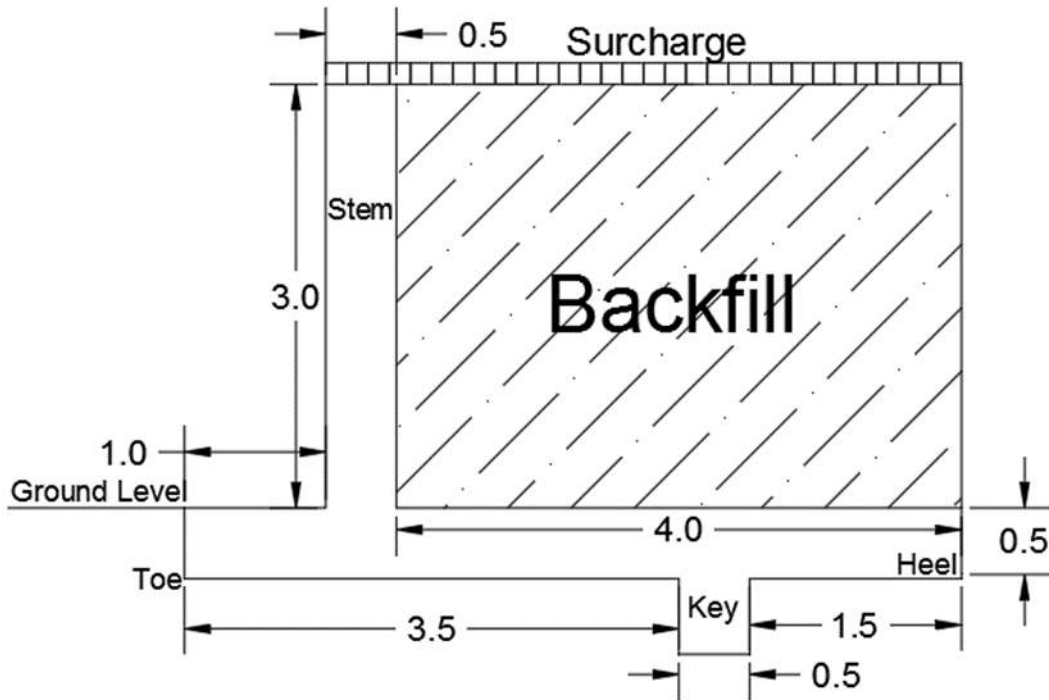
Final design for Underneath Cantilever Retaining wall (meter)
